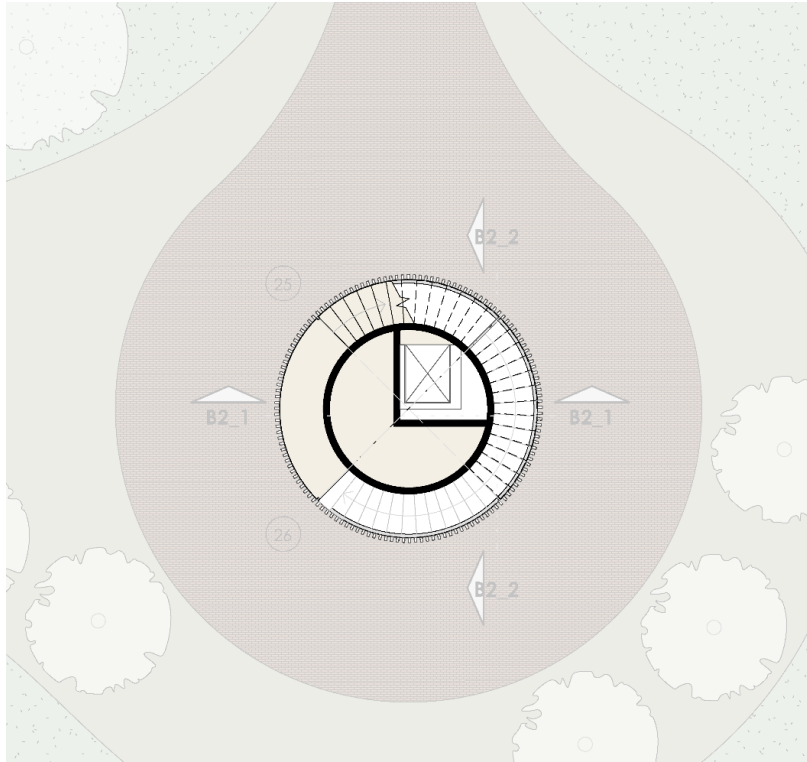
Level 1 floor plan (same in floors above) | 1:200
